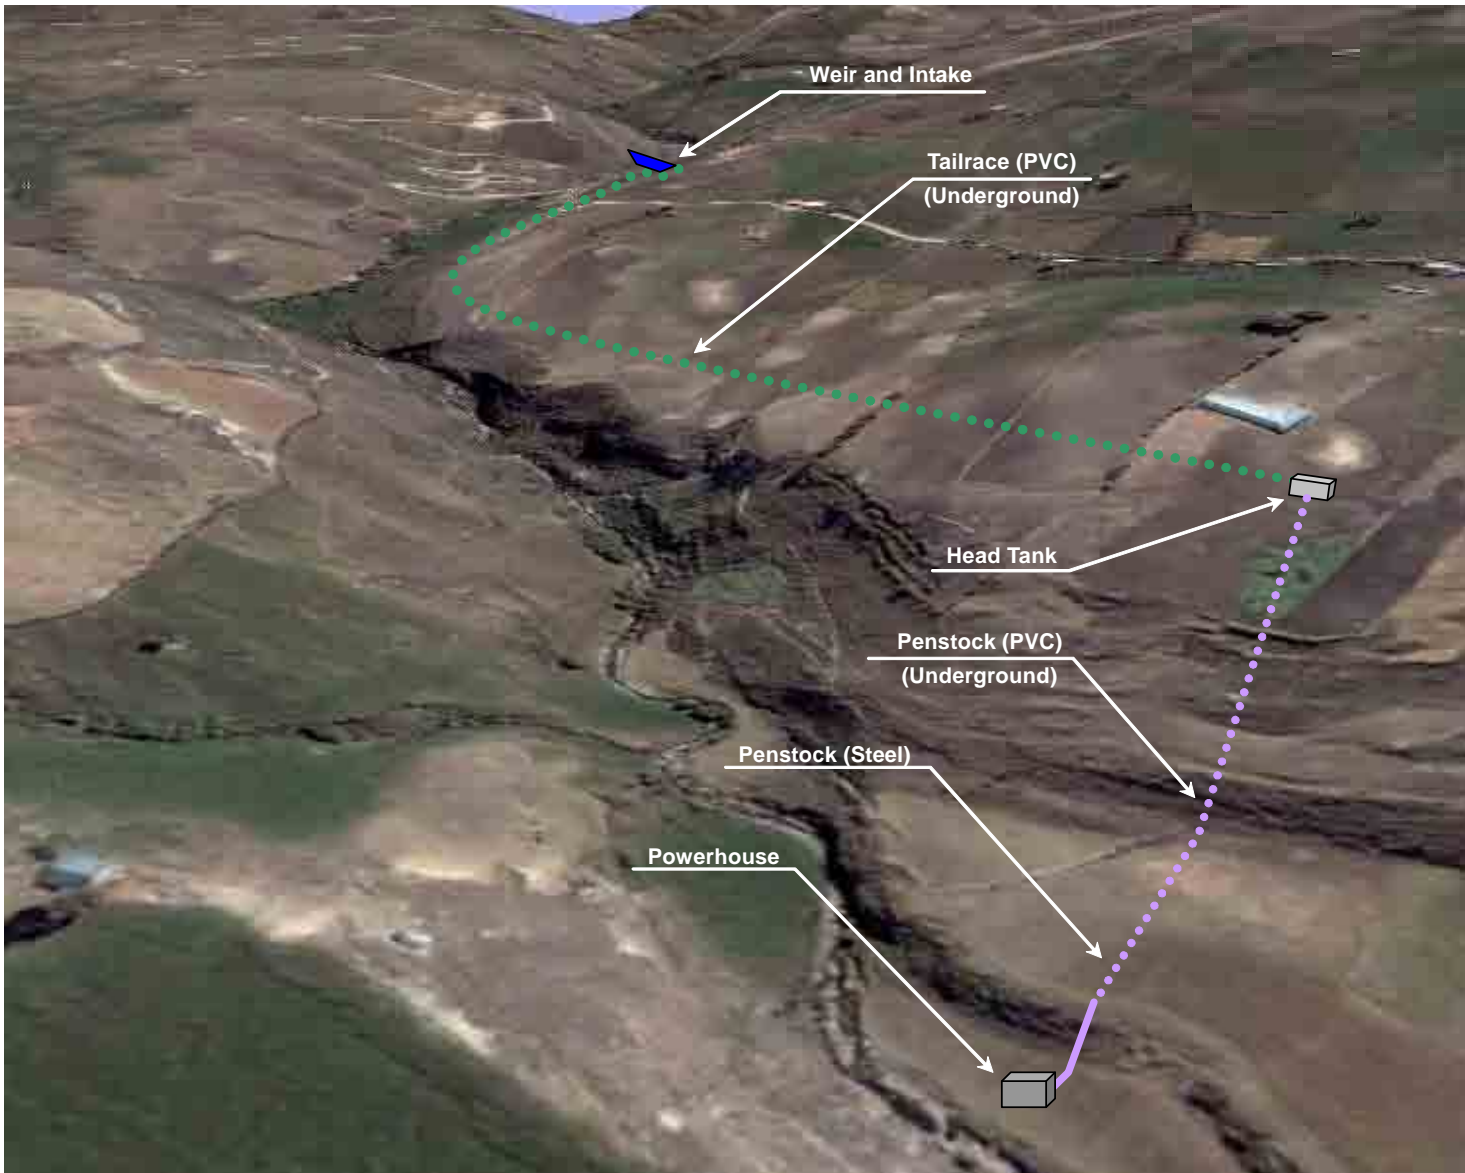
Schematic Image of Yerba Buena Power Station
